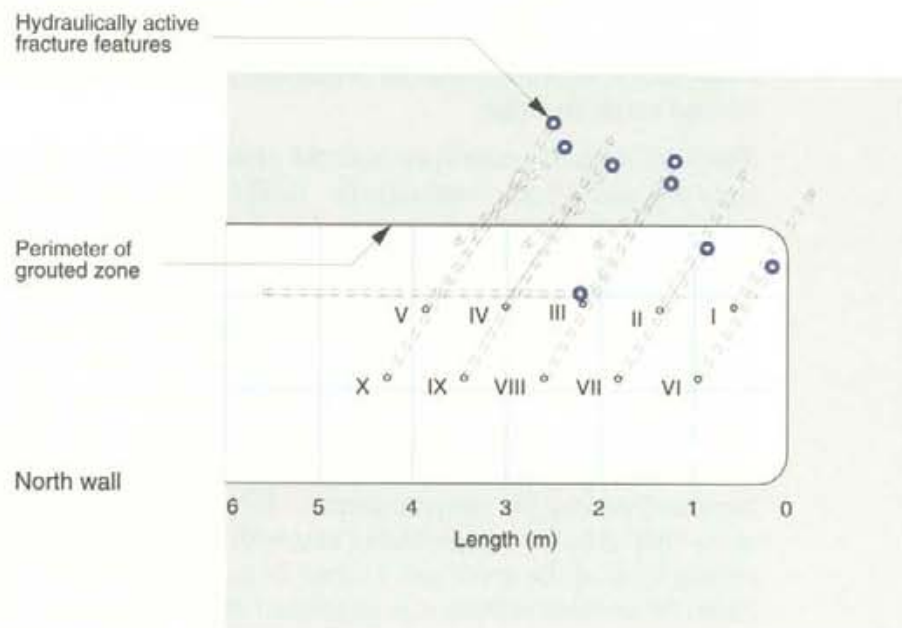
The pattern of holes diamond drilled from the northern wall of the test room and used to penetrate, test and grout the J zone.
